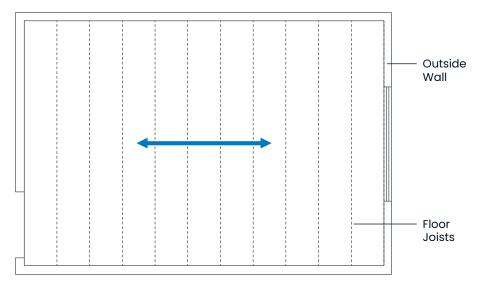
For tile, parquet, and linoleum finished floors, install Quik Trak panels perpendicular to the floor joists. This will add strength to the floor and help prevent deflection of the floor.
